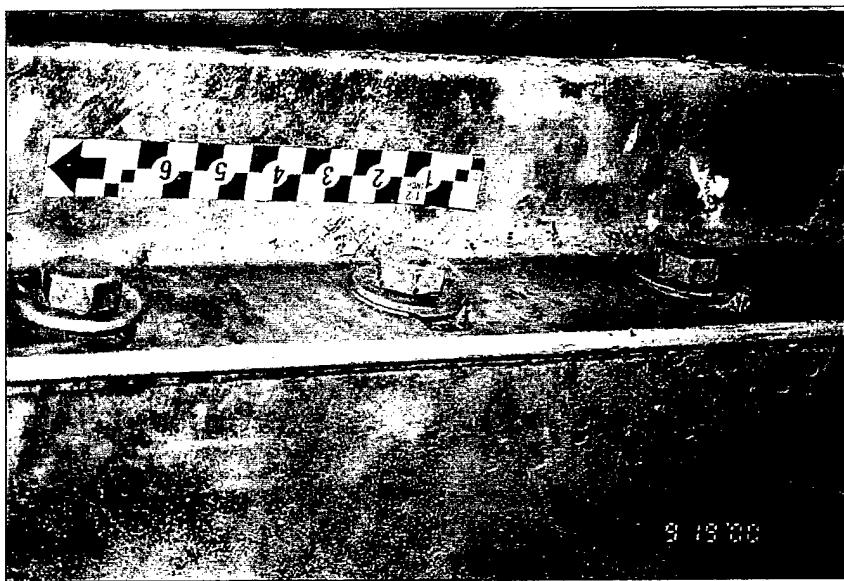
Top girder connection to top seal, flame cut slotted bolt holes.
